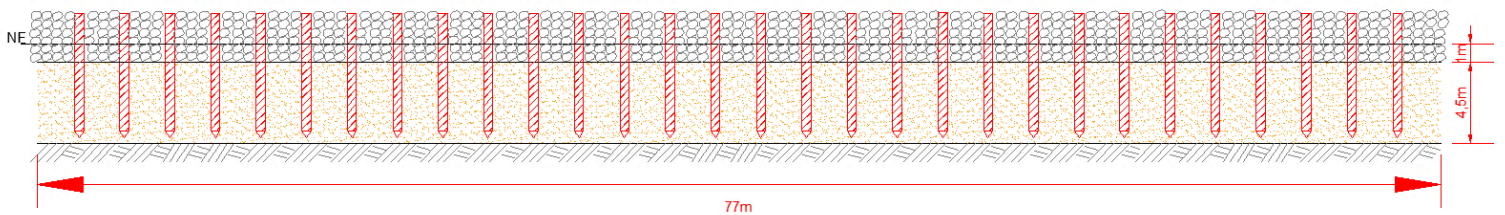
Project elevation of Fortress's foundations using wooden stakes and rockfill layers.
